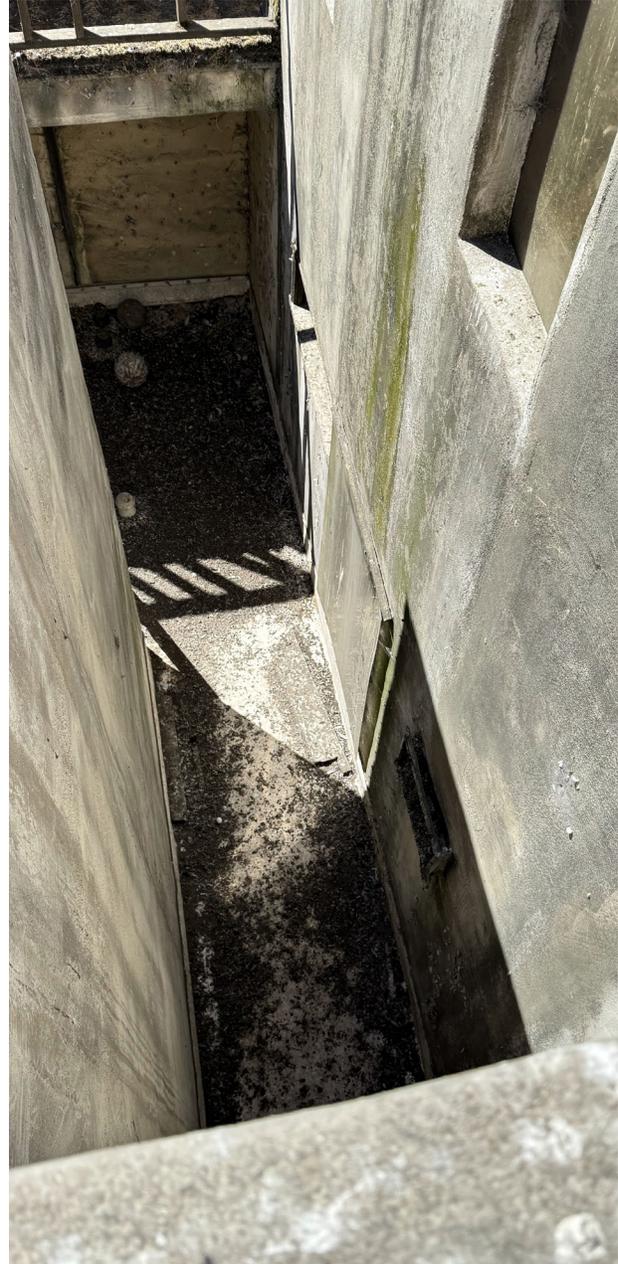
(Right) Looking south at Lightwell 1, TEF, 2025.
